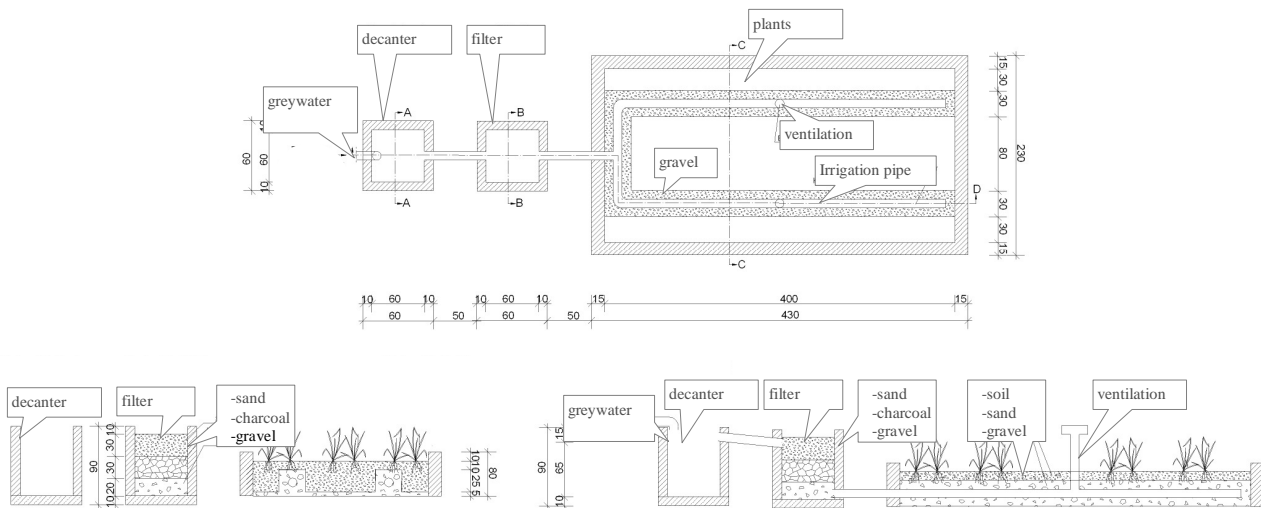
Plan view and cross sections of the greywater garden (source: OtterWasser, 2003)
